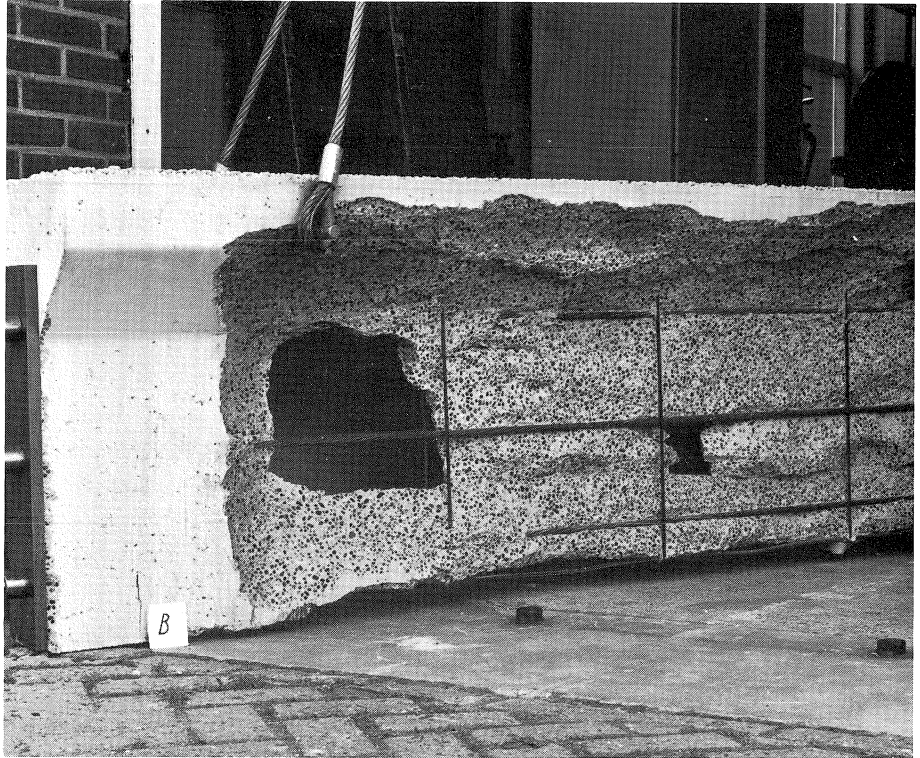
End portion of a prestressed lightweight concrete beam after a fire test.
